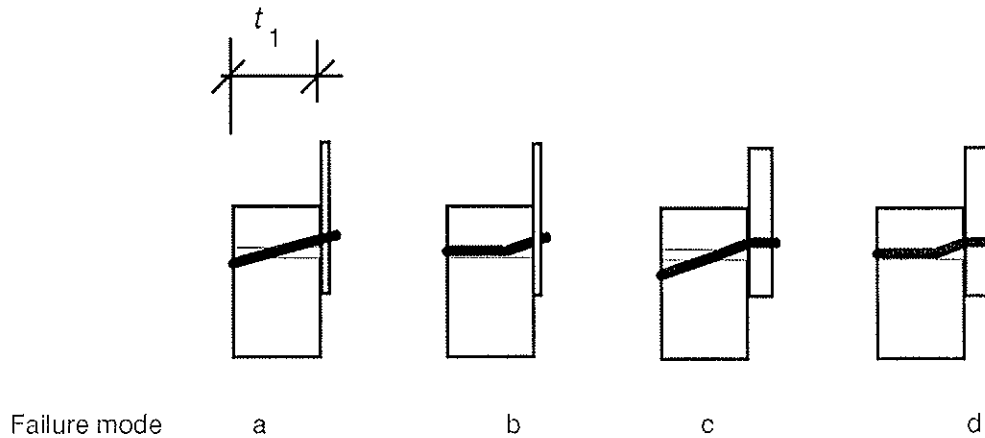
Failure modes for nailed steel-to-timber joints (single shear)
